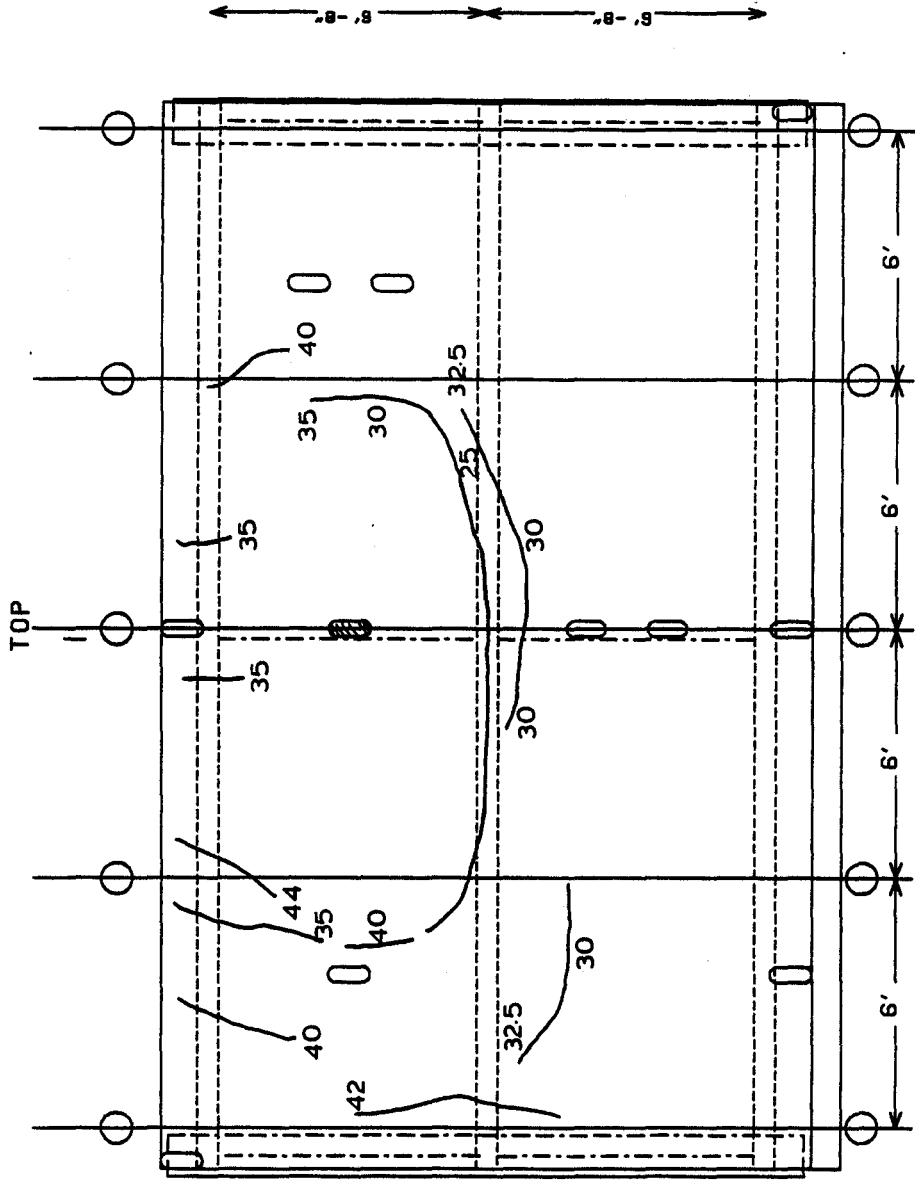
Top Cracking Pattern (First Bridge - Test No. 1)
